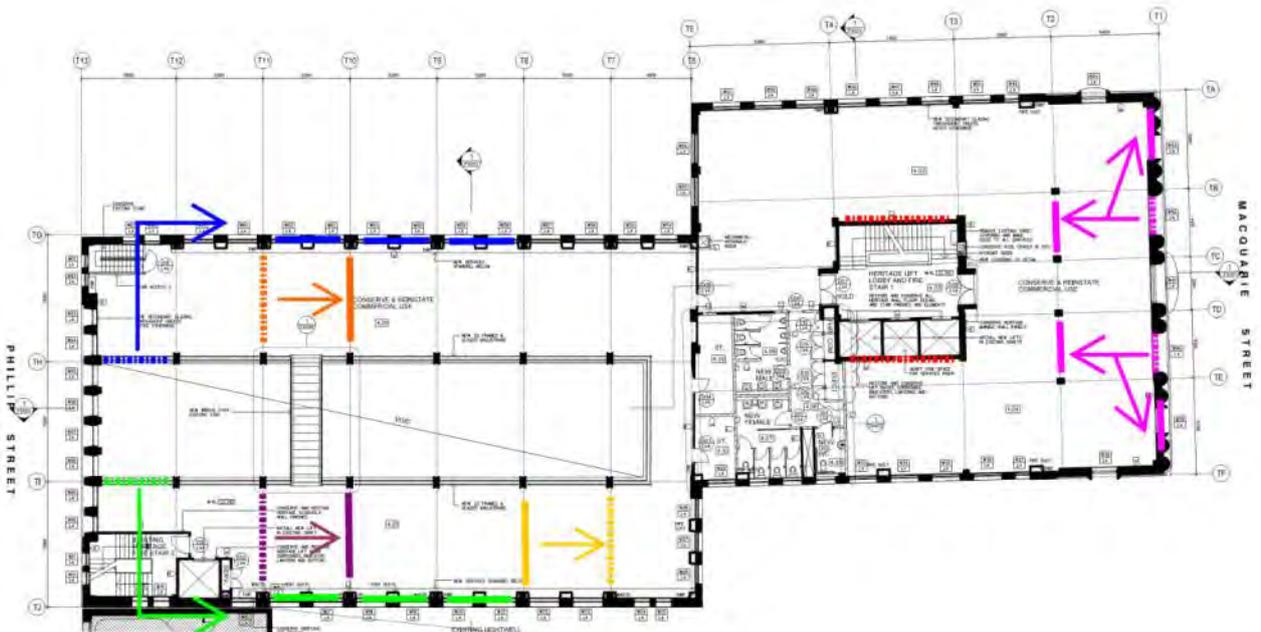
Options for alternative locations of bracing shown on Mezzanine (L4)
